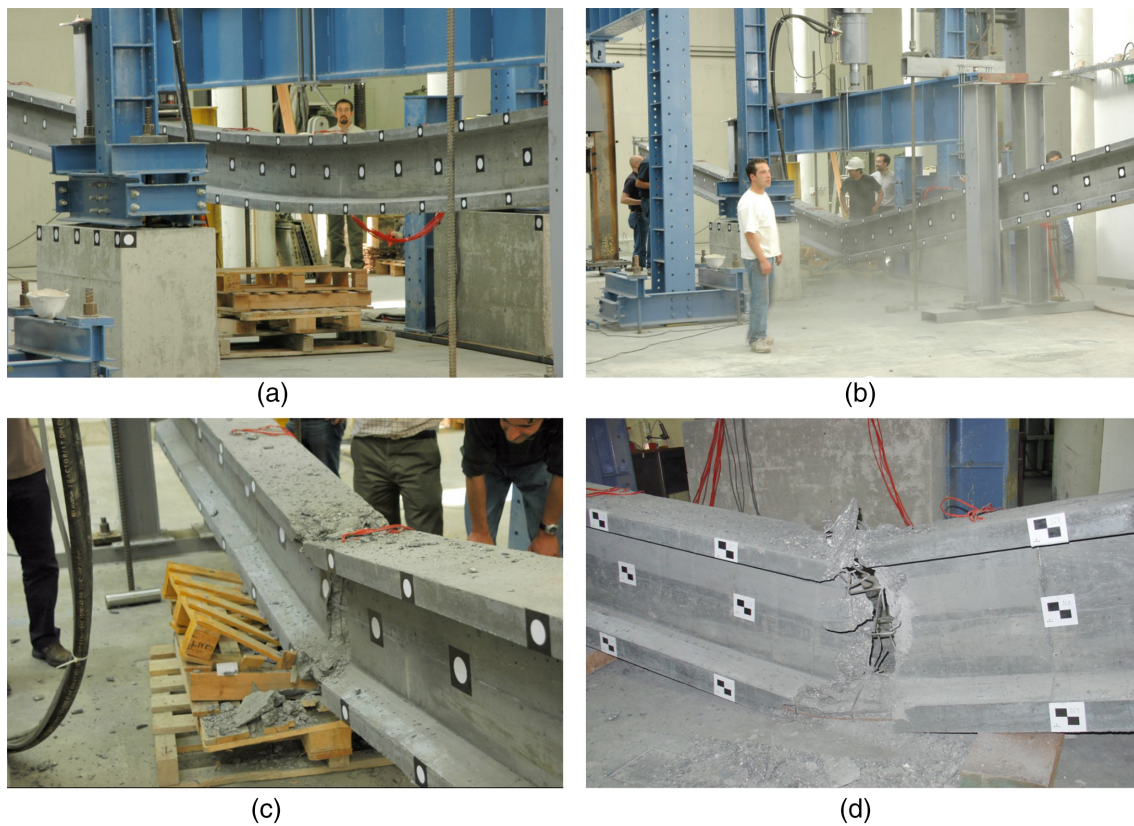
Loading test of specimen V2: (a) stage III (b) collapse; (c) and (d) crushing of concrete and fracture of reinforcing bars at the mid-span section
